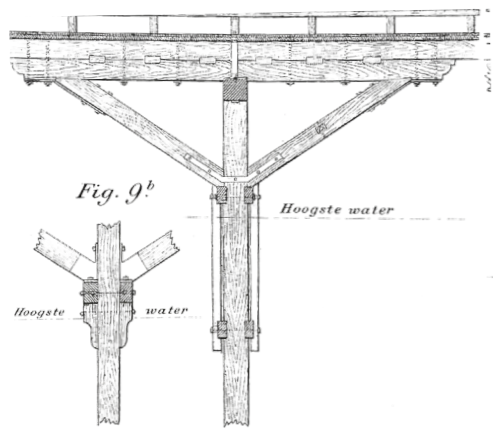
Bridge column with toothed jointing (Henket et al., 1889)
